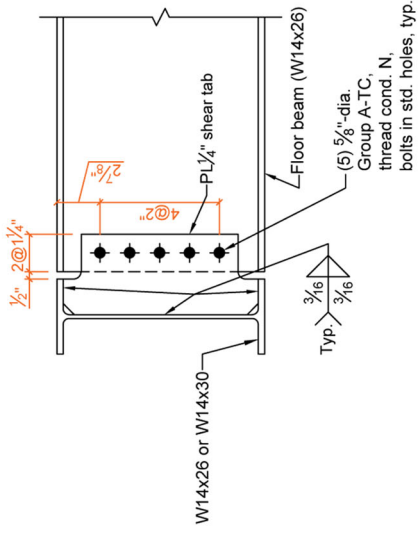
Phase 1 Test Building: Transverse Beam-to-Column Connections
